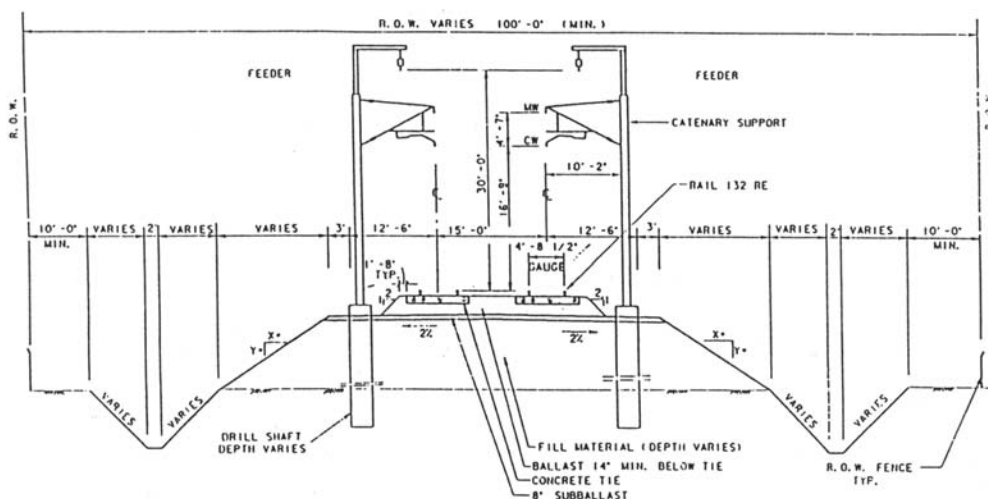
Cross section of track with ballast and grading. (From Texas TGV, Franchise Application, submitted to Texas High-Speed Rail Authority, 1992.)
